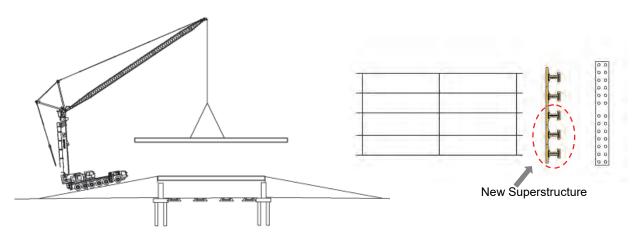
Reconstruction Procedure of Step 6 for Type-2 Bridge
